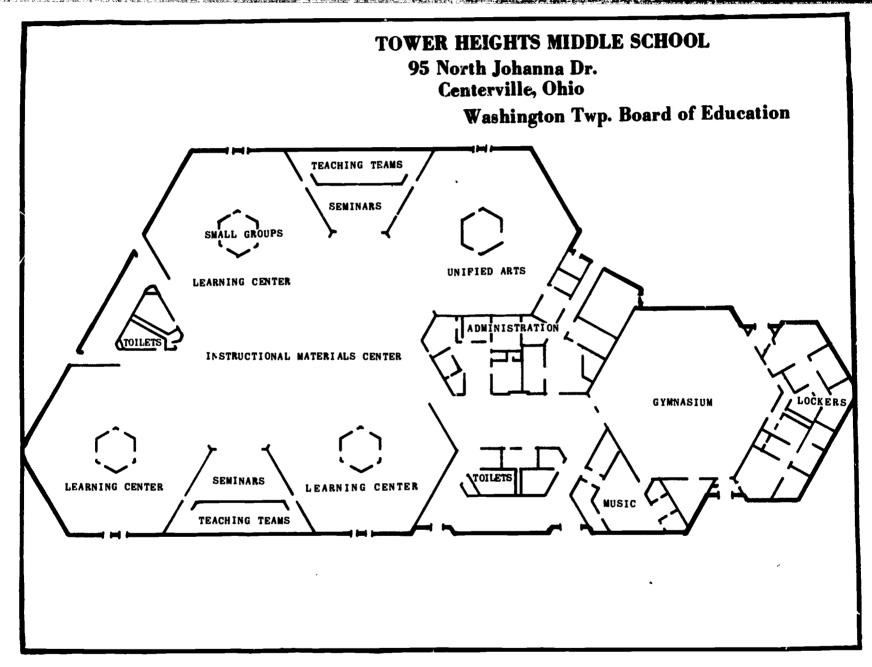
Floor plan of Tower Heights Middle School in Centerville, Ohio
